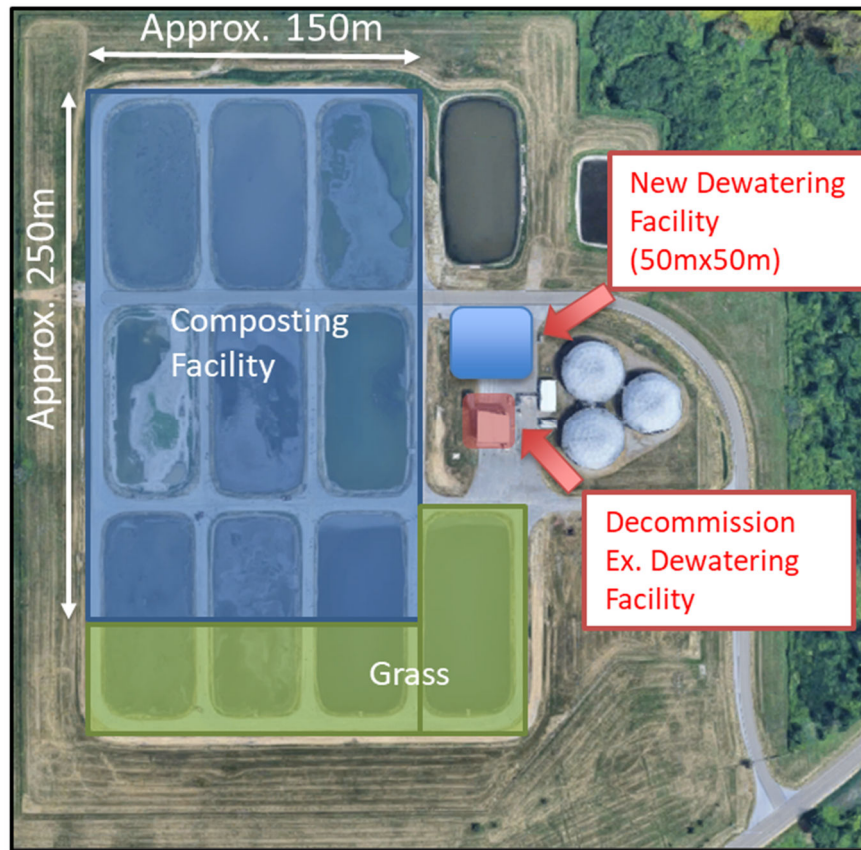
Strategy 5 – Garner Road Facility – Conceptual Site Plan
